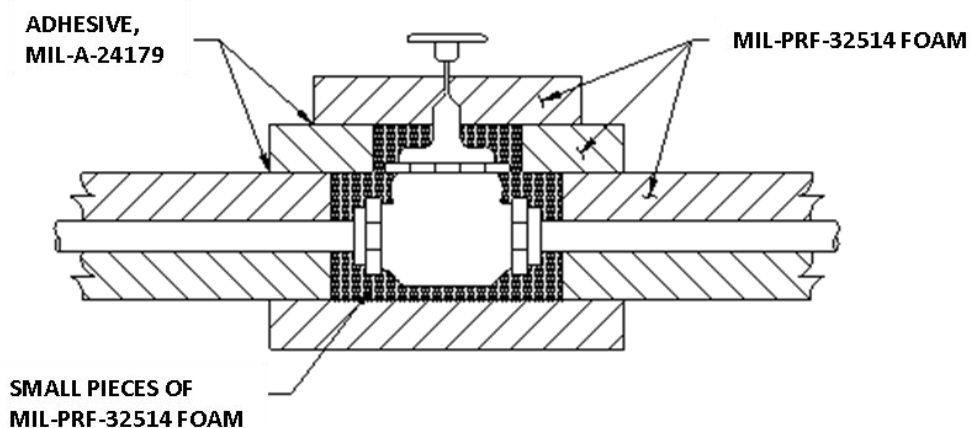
Typical method of insulating cold water valve with pre-formed sectional pipe insulation.
